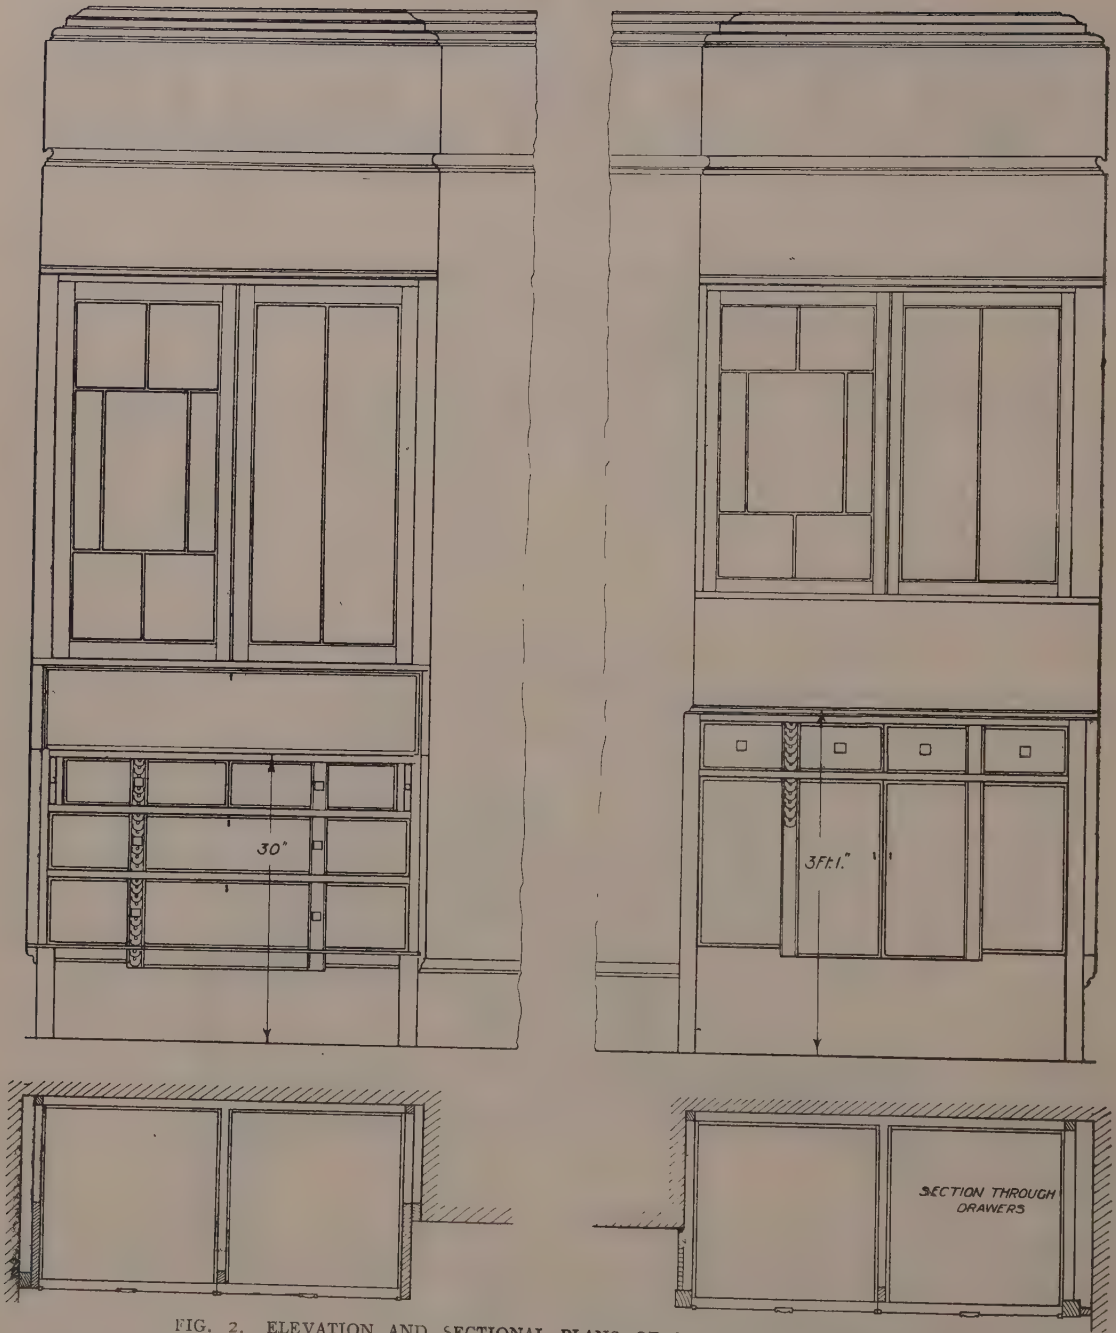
ELEVATION AND SECTIONAL PLANS OF THE FITTED RECESSES.
